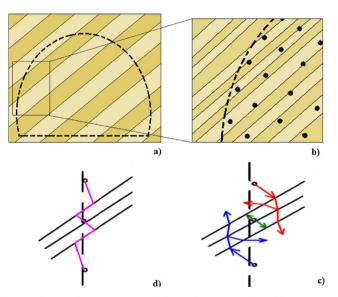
Overbreak and underbreak in drill and blast tunneling.
